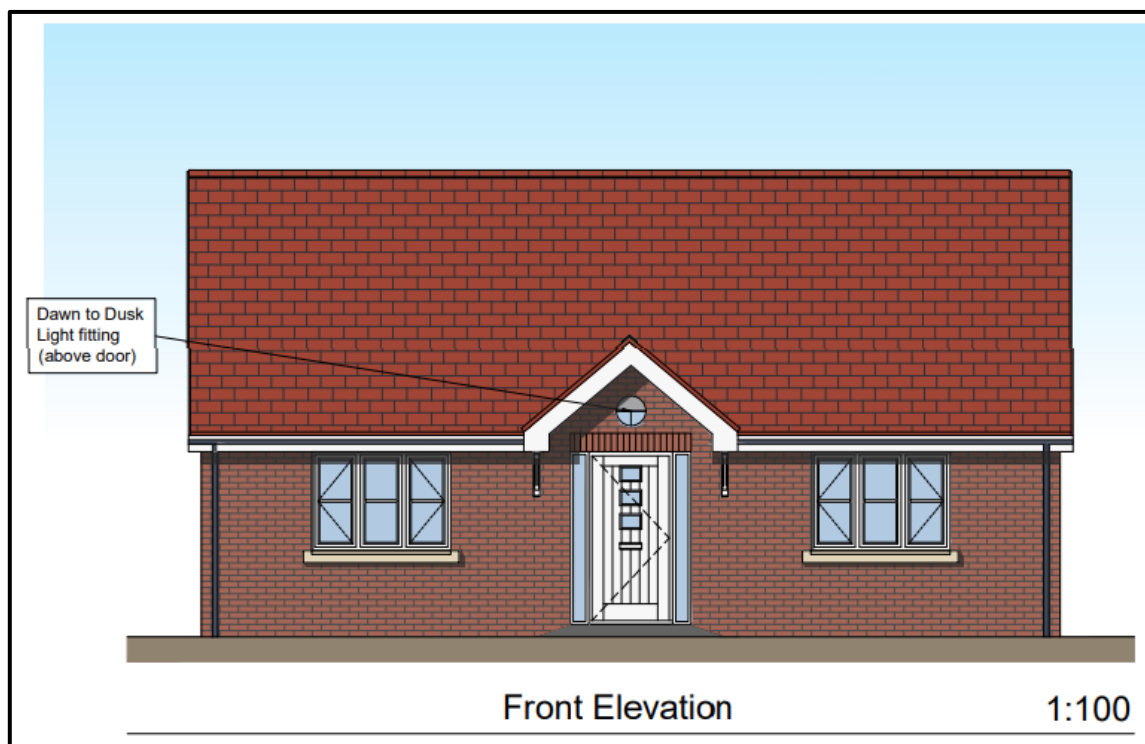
Typical 4p2b Detached Bungalow with brick finish
